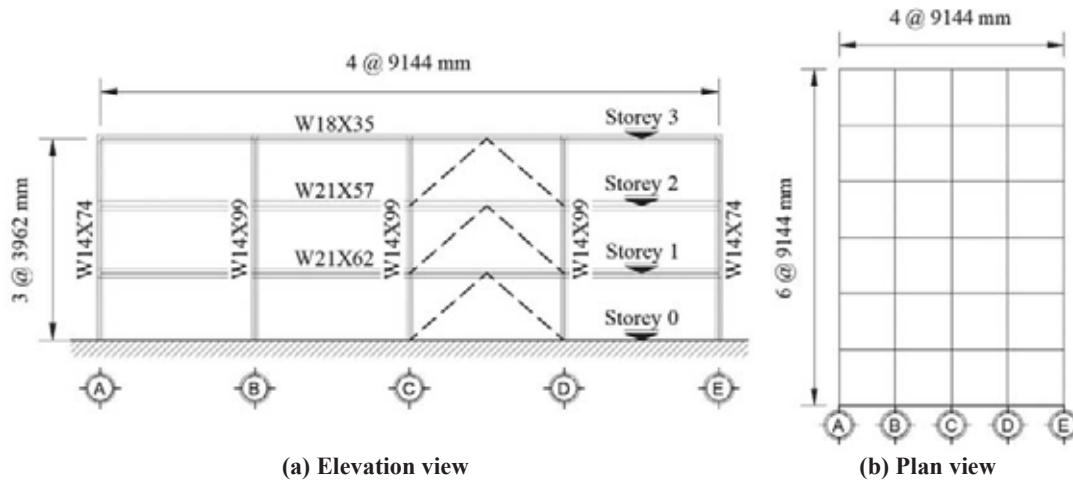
Description of the case-study structure: (a) elevation view of the MRF and location of braces in the retrofitting schemes; (b) plan view of the typical storey floor.
